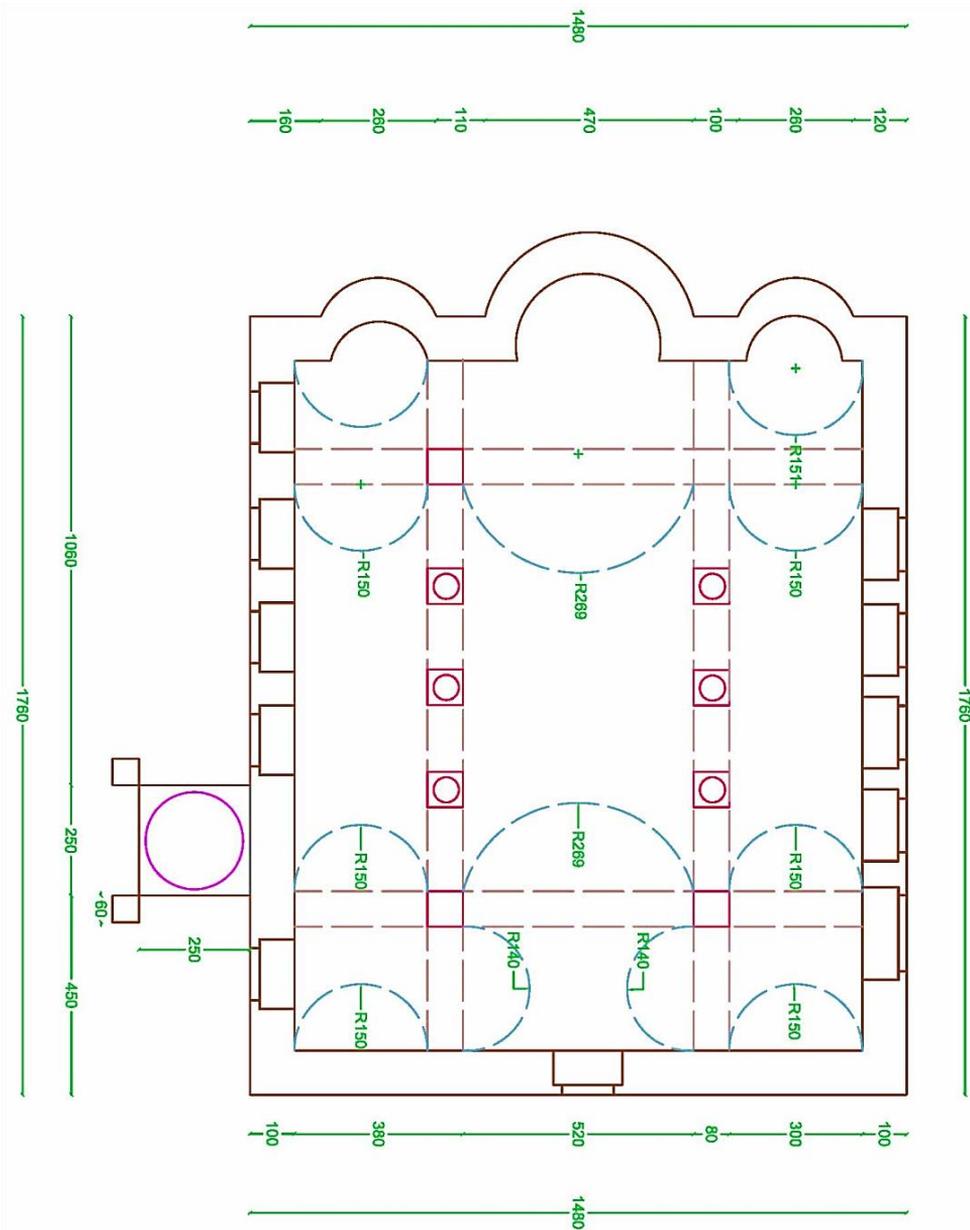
Plan view of the St. Sotiri's Basilica (Units in cm)
